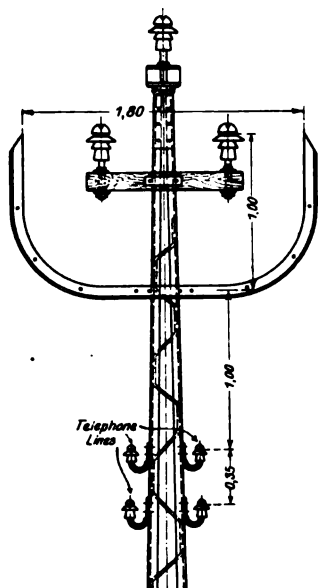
Type of 35,000-volt Tower with Brackets for Guard, Heimbach Plant, Germany.
